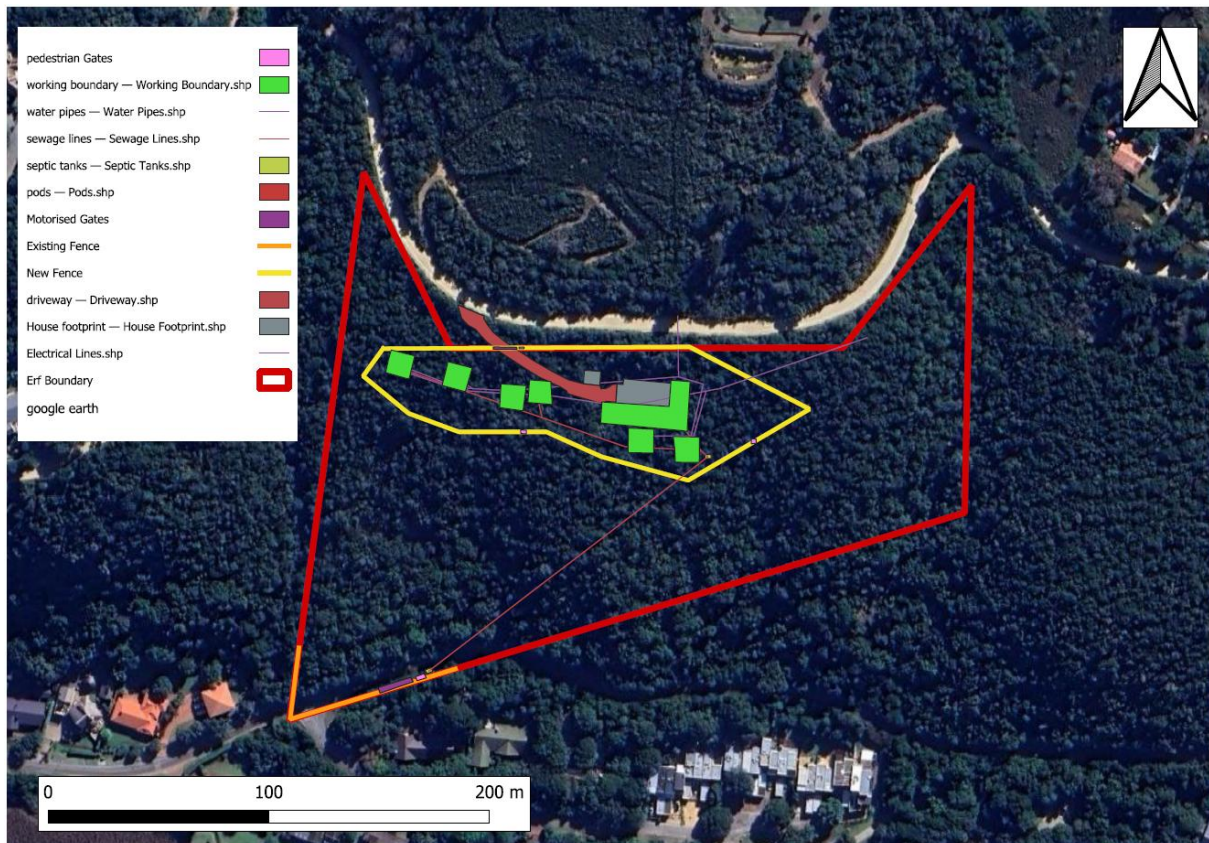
Site Development Plan for Erf 301 Hoekwil in Wilderness.
